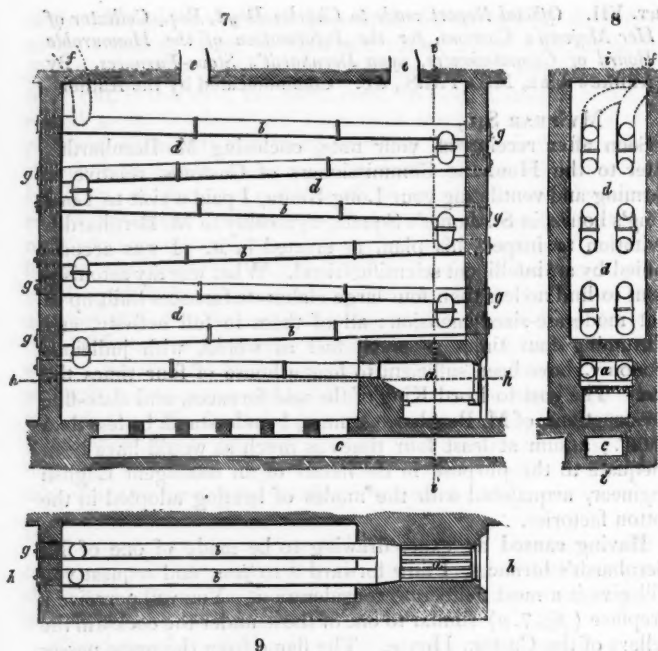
is a ground plan, showing the furnace and the two lowest sheet-iron pipes.
